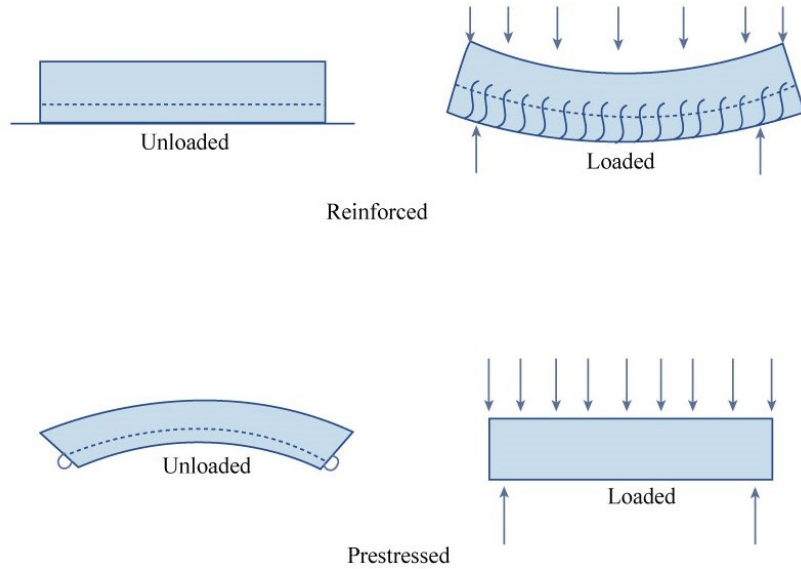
Behaviour of a reinforced concrete beam compared to a prestressed concrete beam (MIT OpenCourseWare, 2008). CC BY-NC-SA.
